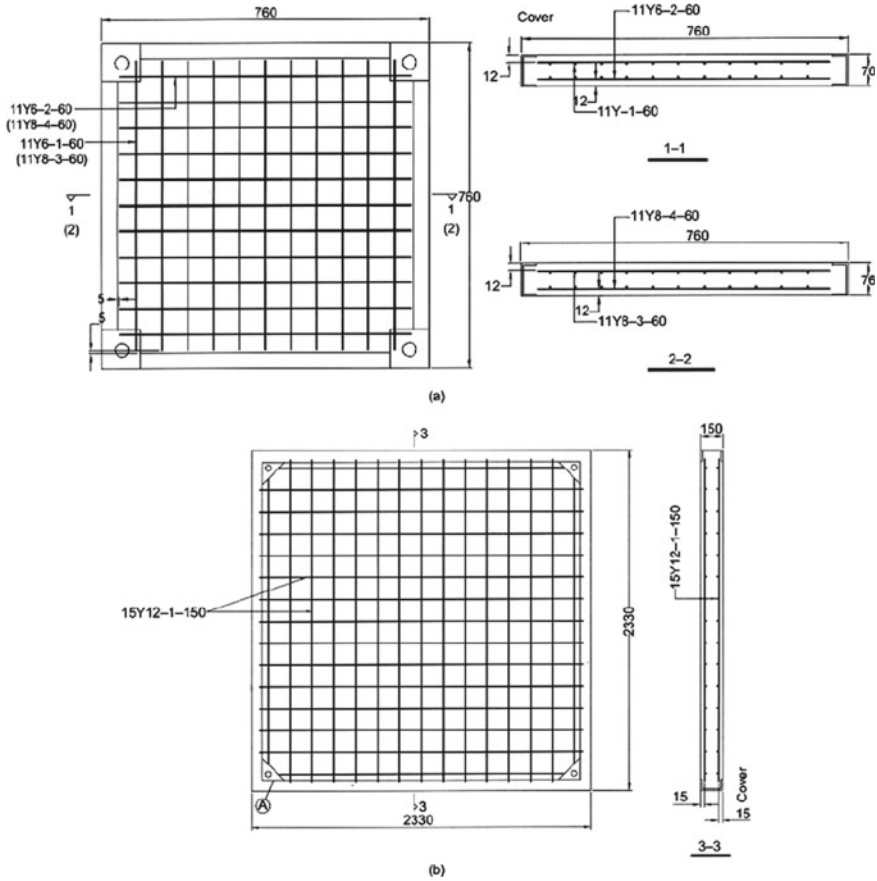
Details of the slabs: a 760 × 760 mm slab and b 2330 × 2330 mm slab (All dimensions are in mm)
